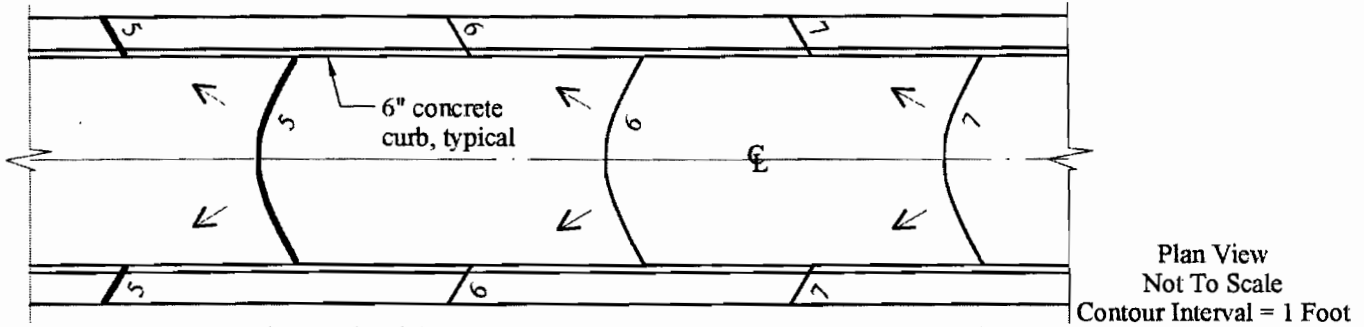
Asphalt Road With Six-Inch Concrete Curbs and Sidewalks Signature
